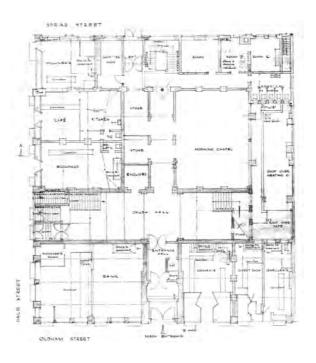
Ground floor plan of the reinstated hall. Source: Halliday Meecham.
